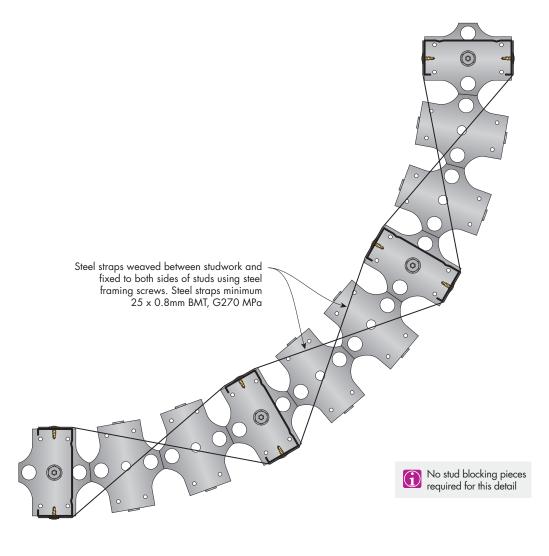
Strap Nogging for Curved Stud Walls Plan
